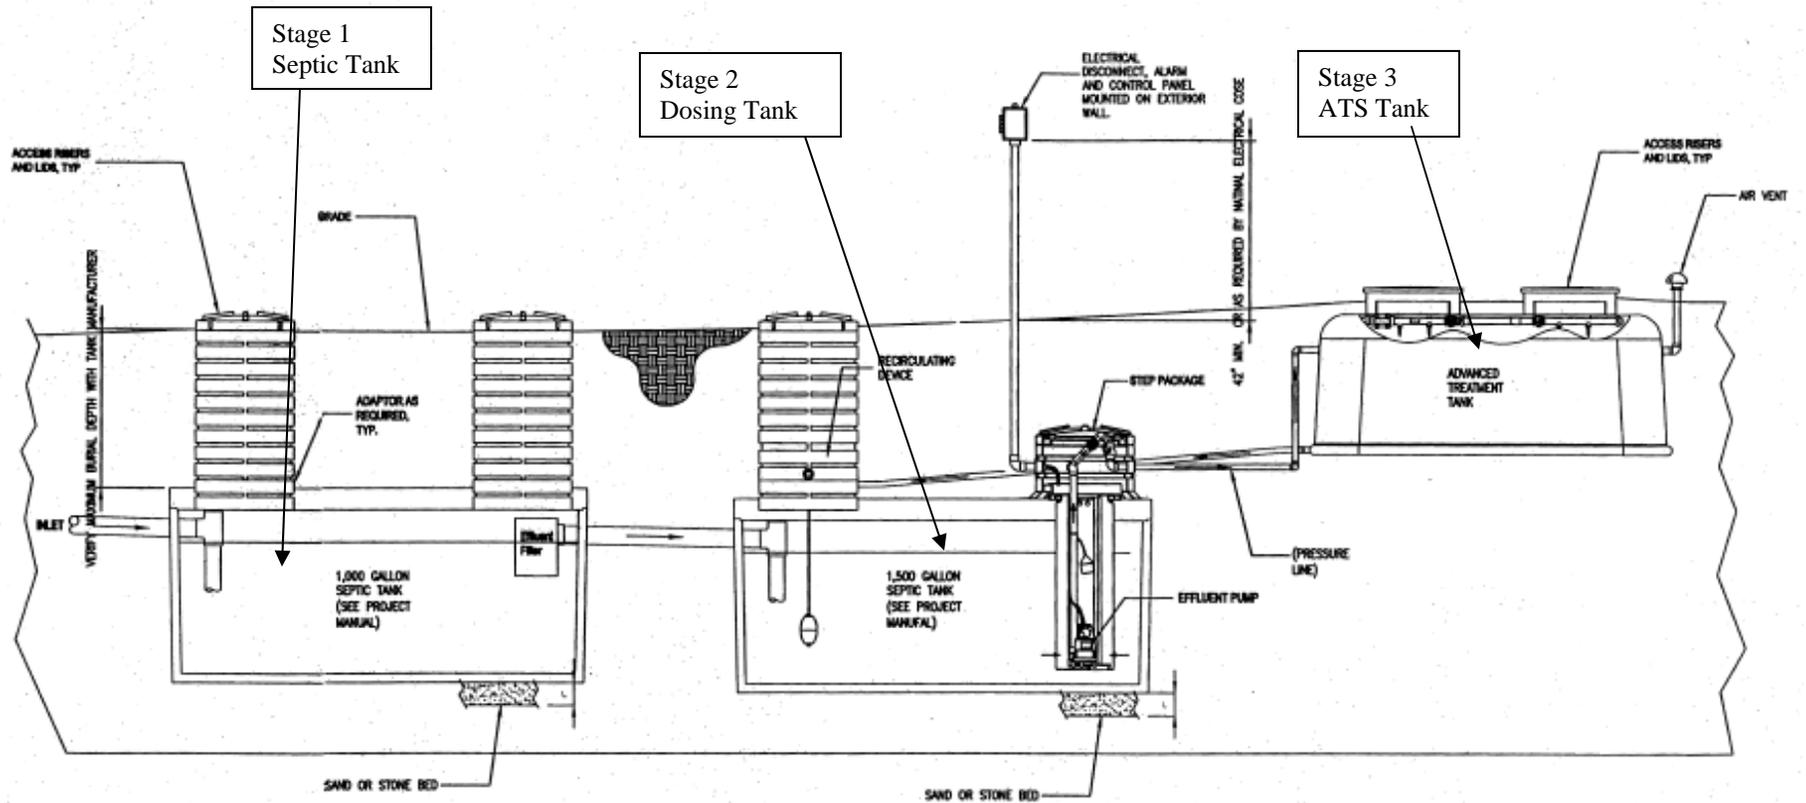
Section View of the Proposed Project Sewage Treatment Plant
